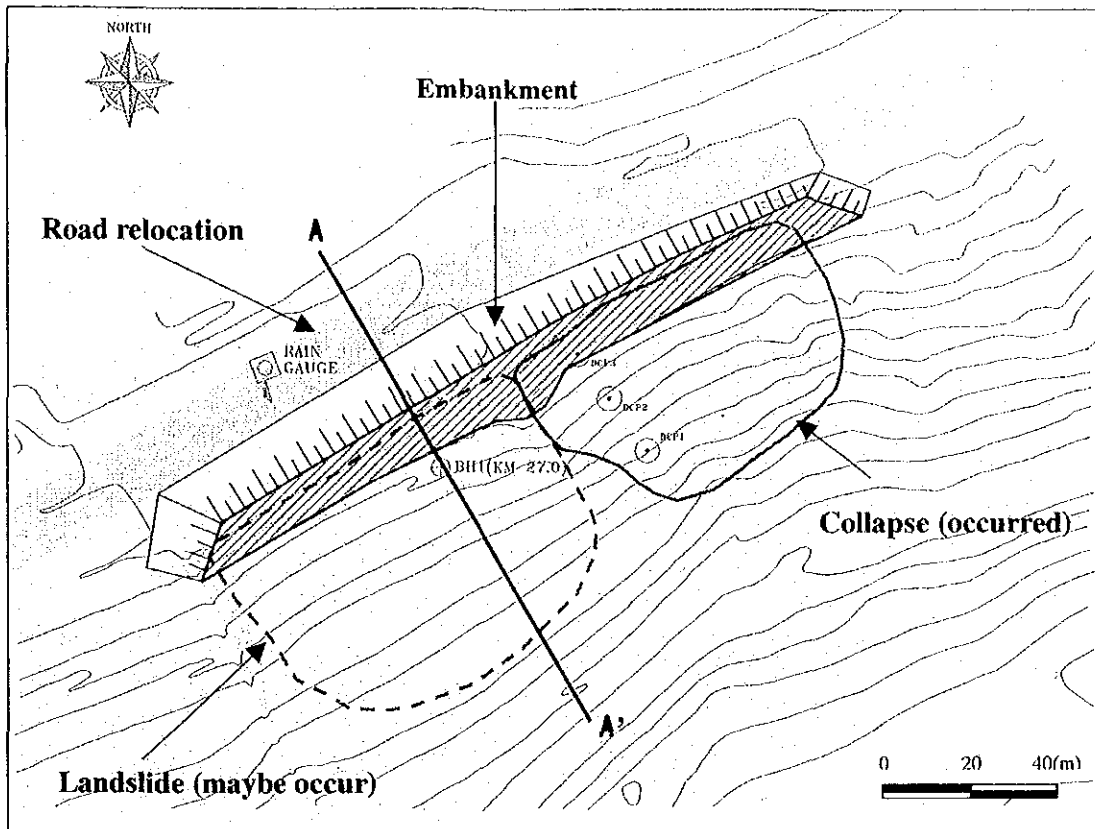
Plan of countermeasure embankment in CH 27.00 km
